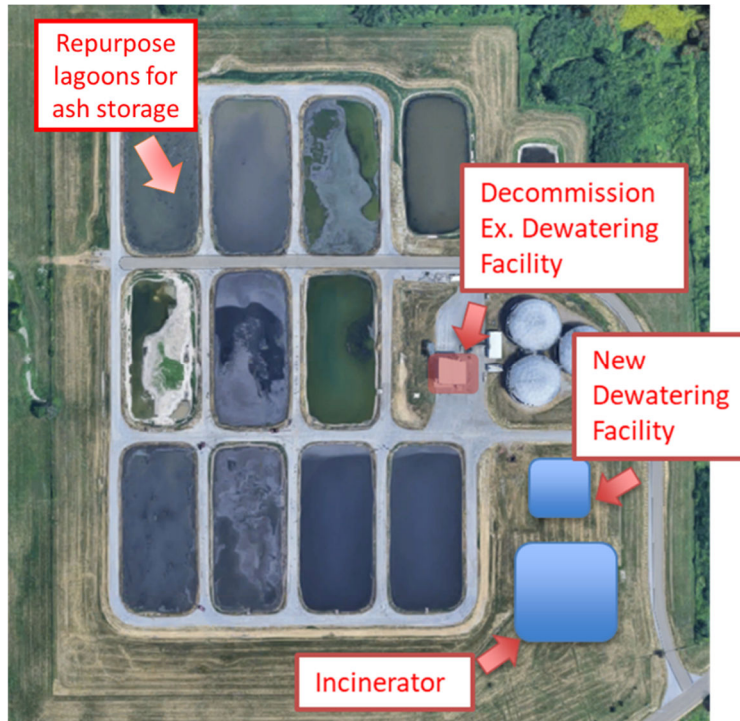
Strategy 7 – Garner Road Facility – Conceptual Site Plan
